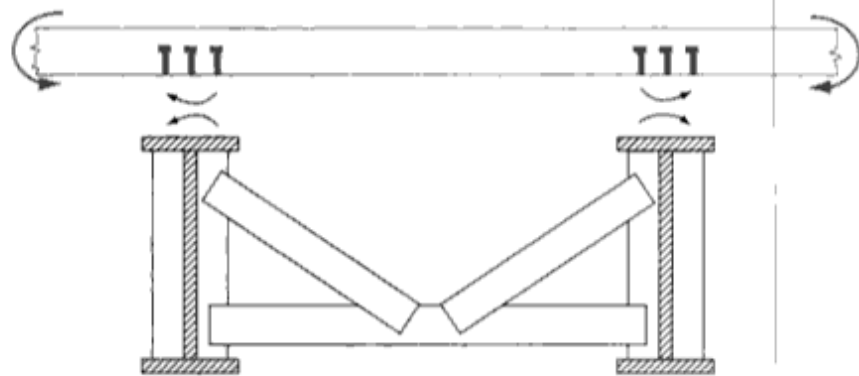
Example of bending moments from a deck slab attracted into bracings
